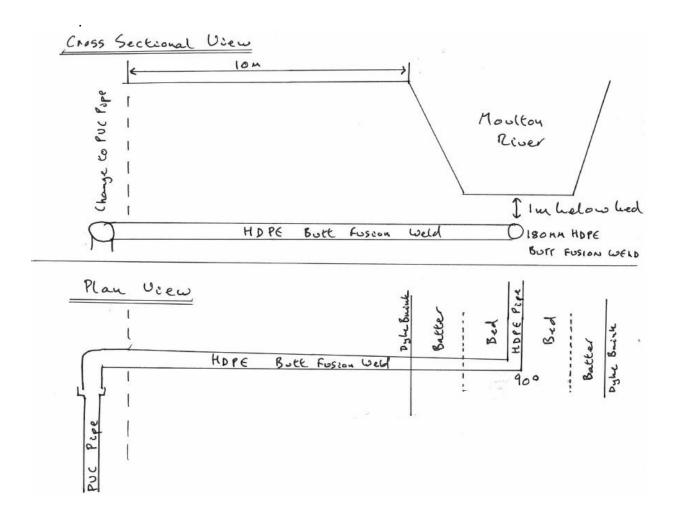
Plan detailing the proposed connection at the Northern end of proposed HDPE irrigation main.
